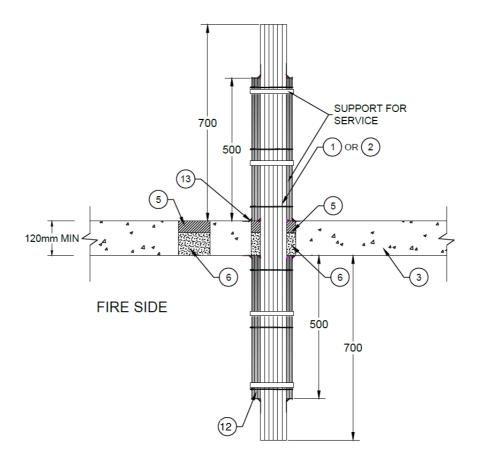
Typical details for cables and metal pipes penetrating floors wrapped with Emat
